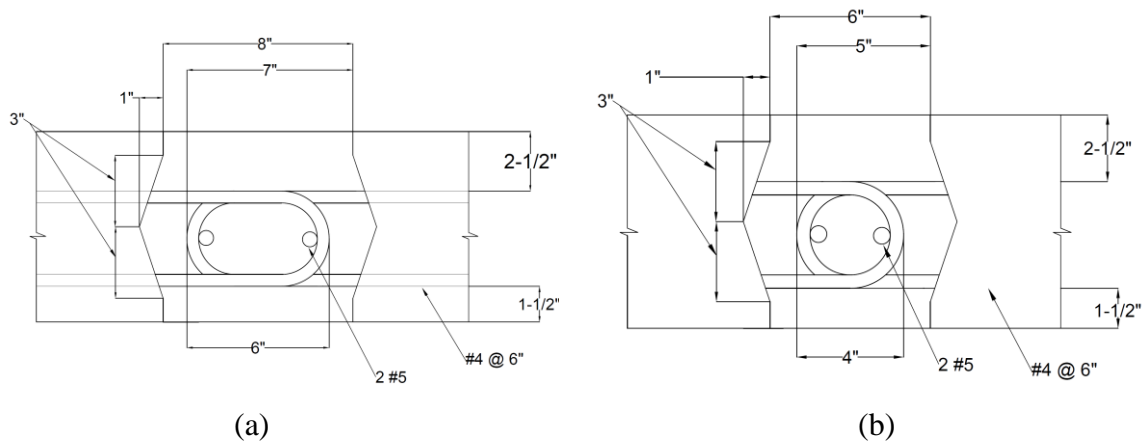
Elevation view (a) 8 in. longitudinal joint (b) 6 in. longitudinal joint
